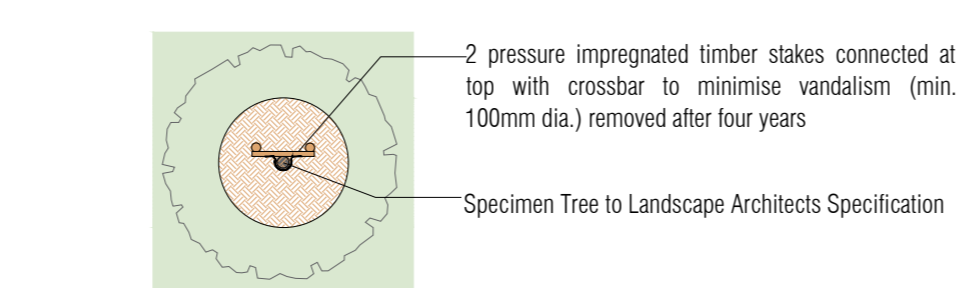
Standard Tree Planting Specification up to 18-20cm girth
